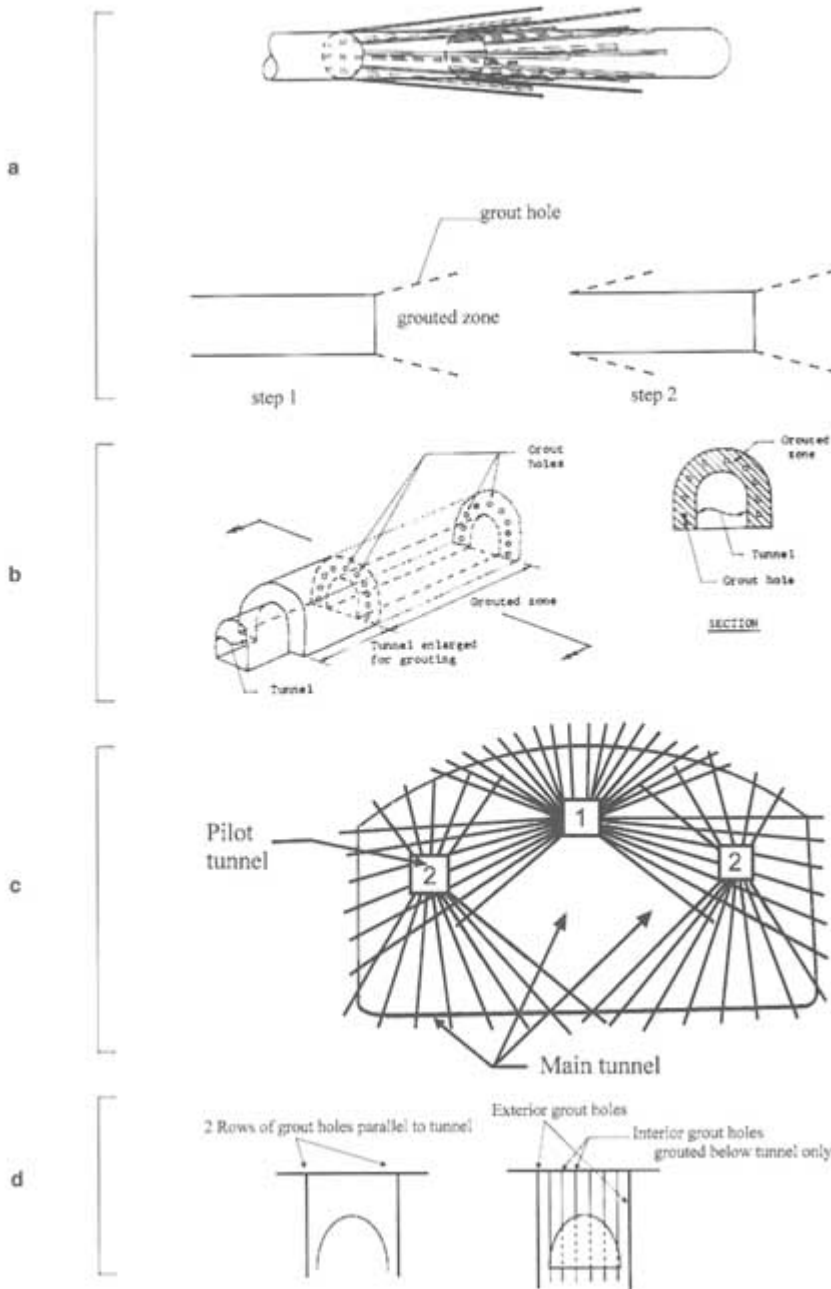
Tunnel grouting. (a) Grouting in fan pattern. (b) Grouting from an enlarged section. (c) Grouting with radial arrangement of grout holes. (d) Grouting from the surface.
